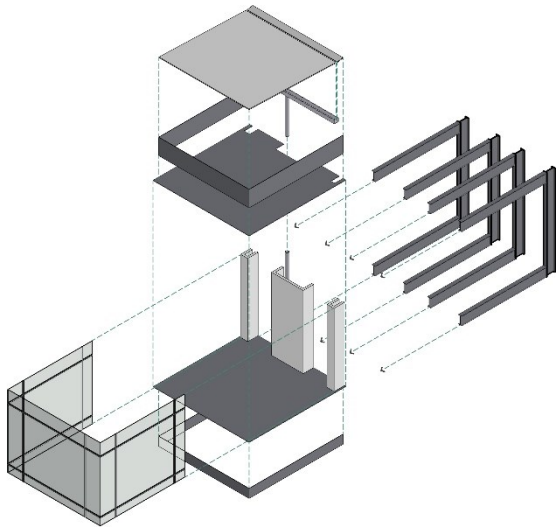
Exploded diagram of the typical single storey module. Size, orientation and assembly may differ.
